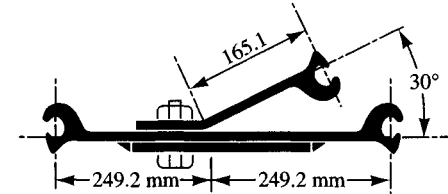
Sheetpiling and connections used in cellular cofferdam construction. Bolts are A325 with washers (usually 22-mm diam) at 115-mm spacing except 600-mm end zones where spacing is 75 mm. (Figure is a composite from Bethlehem Steel Corporation booklet No. 2001).
